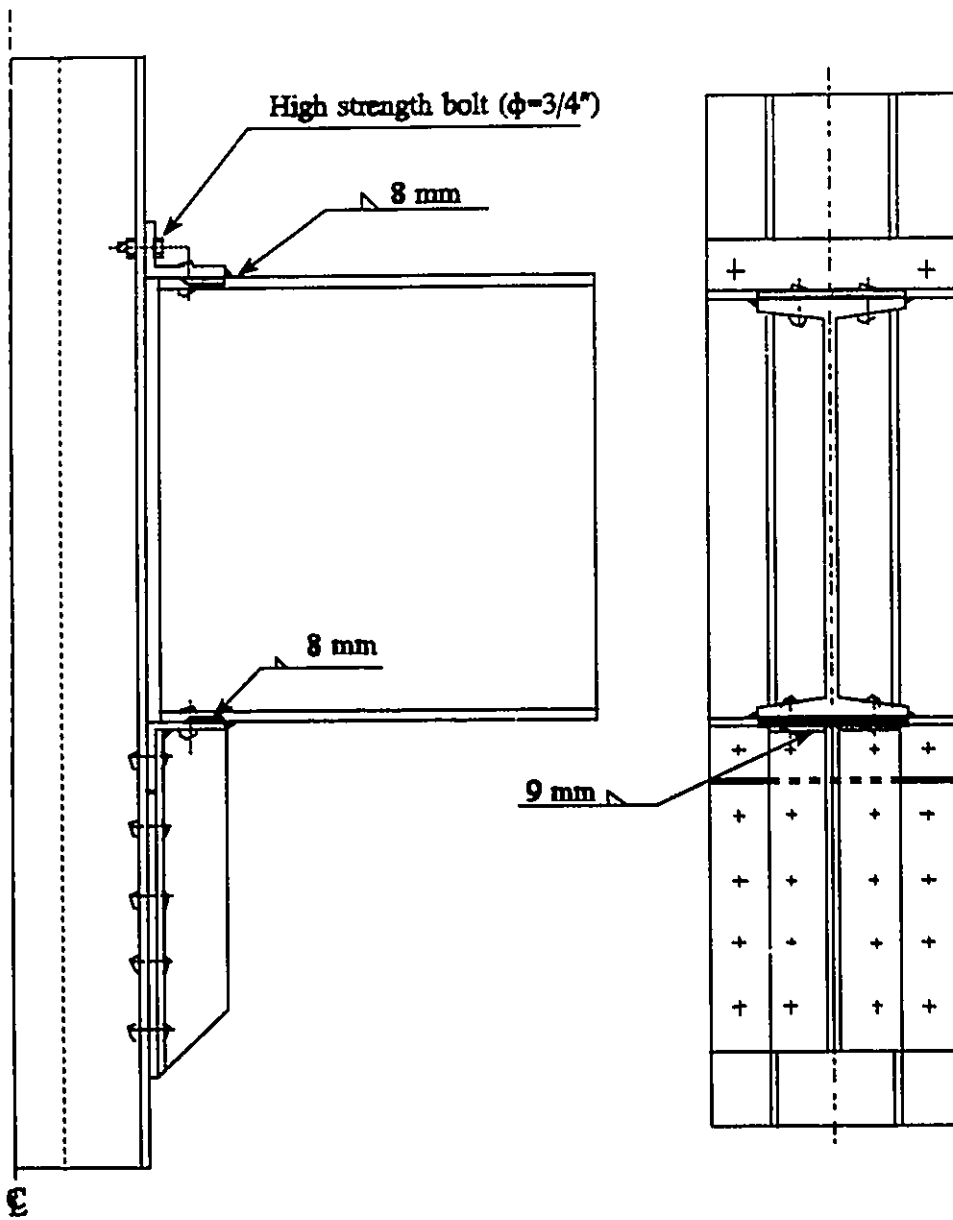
Weldings and location of high strength bolts in connection detail 2 used in Specimen 4
